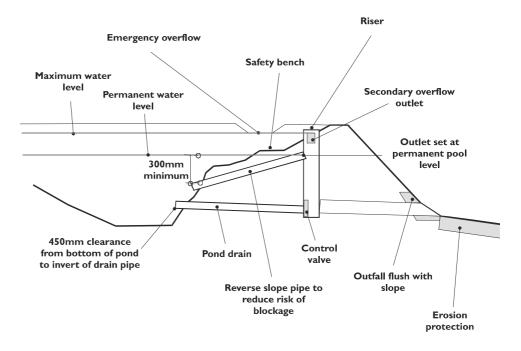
Example outlet detail for ponds (Minnesota Metropolitan Council, 2001)
